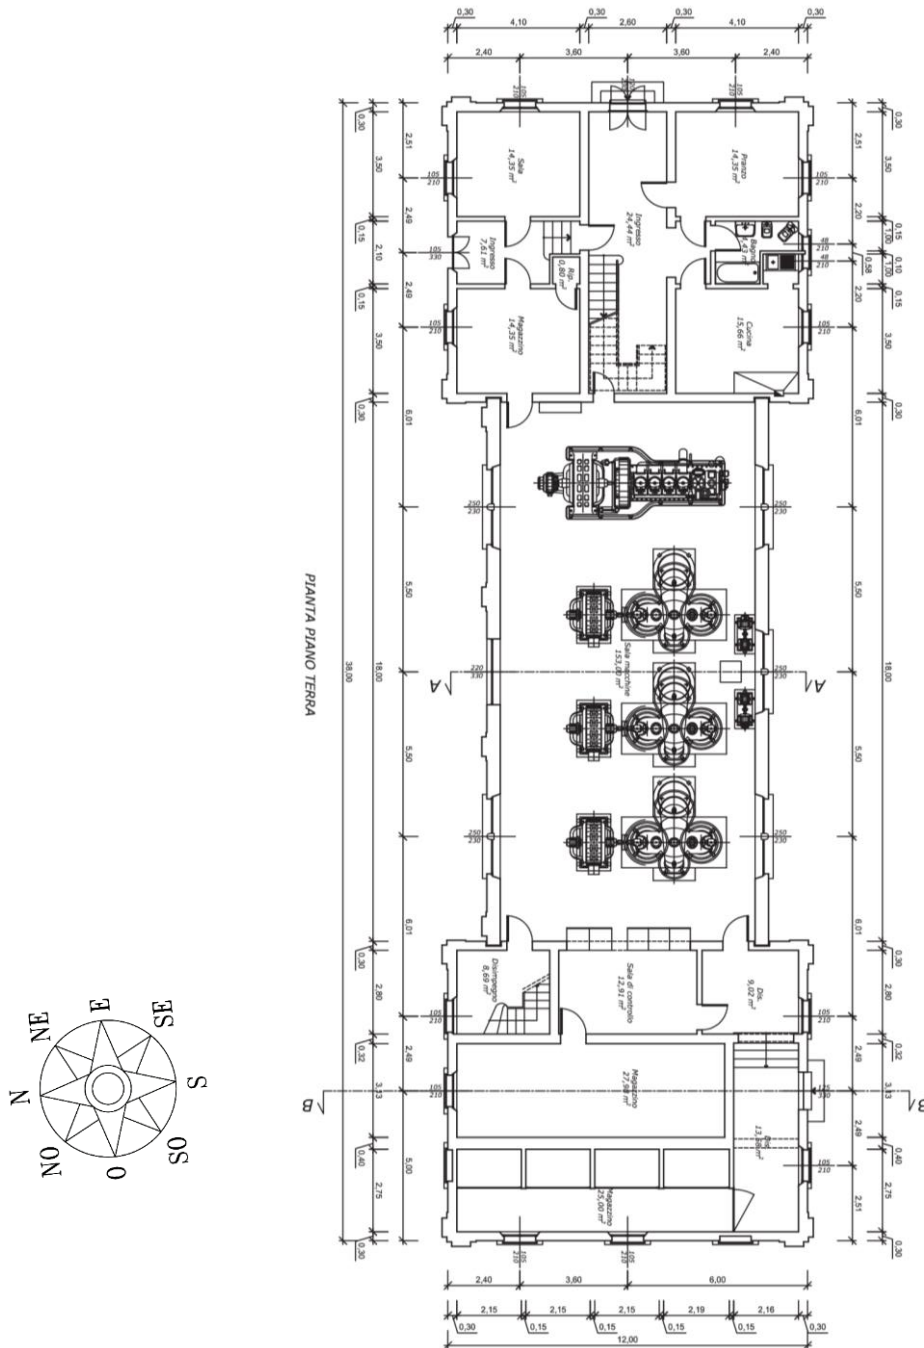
S. Antonino pumping station horizontal section, ground floor.
